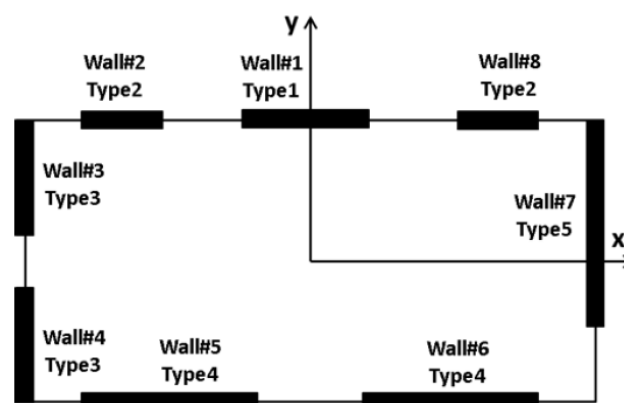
23: Hypothetical wall structural plan for DBA example (internal gravity frames not shown)
